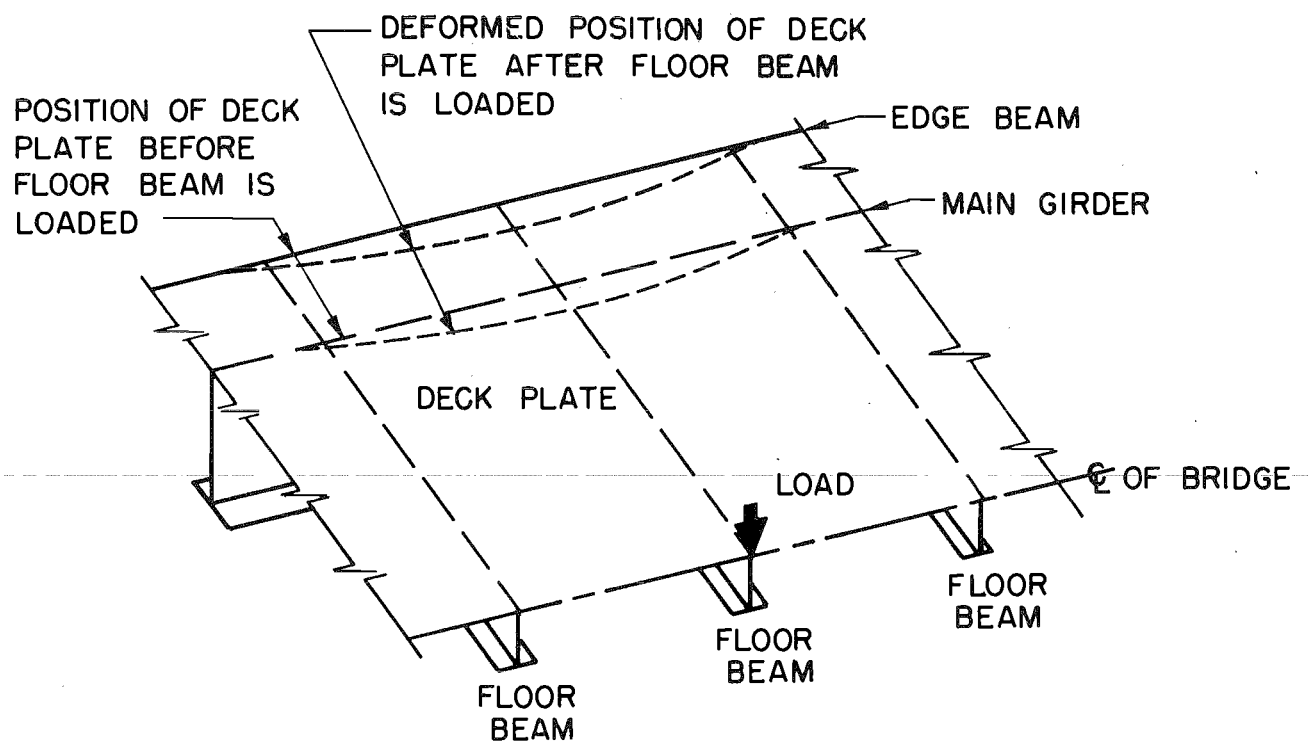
DECK PLATE DEFORMATION RESULTING FROM A LOAD ON ONE FLOOR BEAM.
